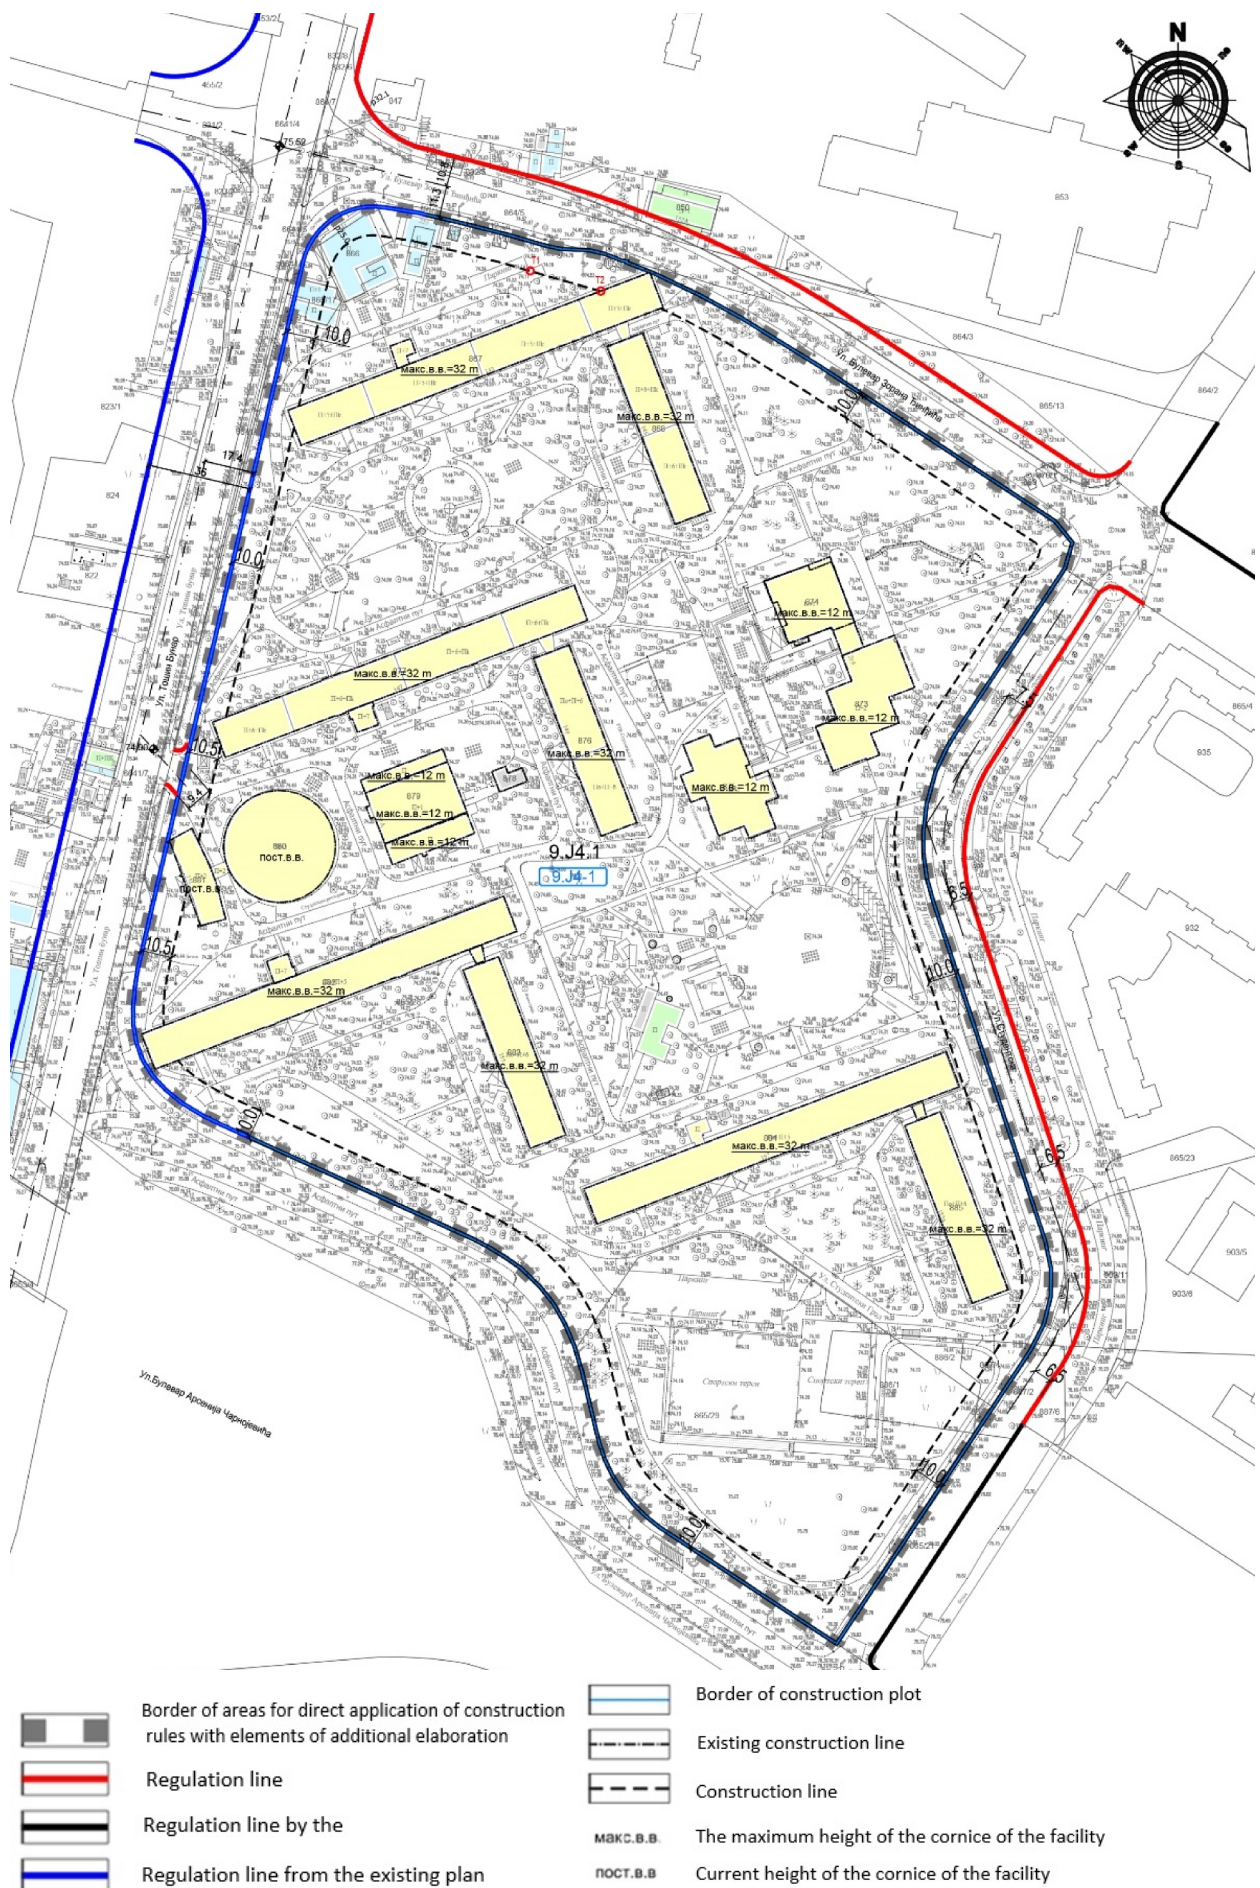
Excerpt from Belgrade GRP, attached figure NB 9.1-R - Regulation and levelling plan and parcellation plan
